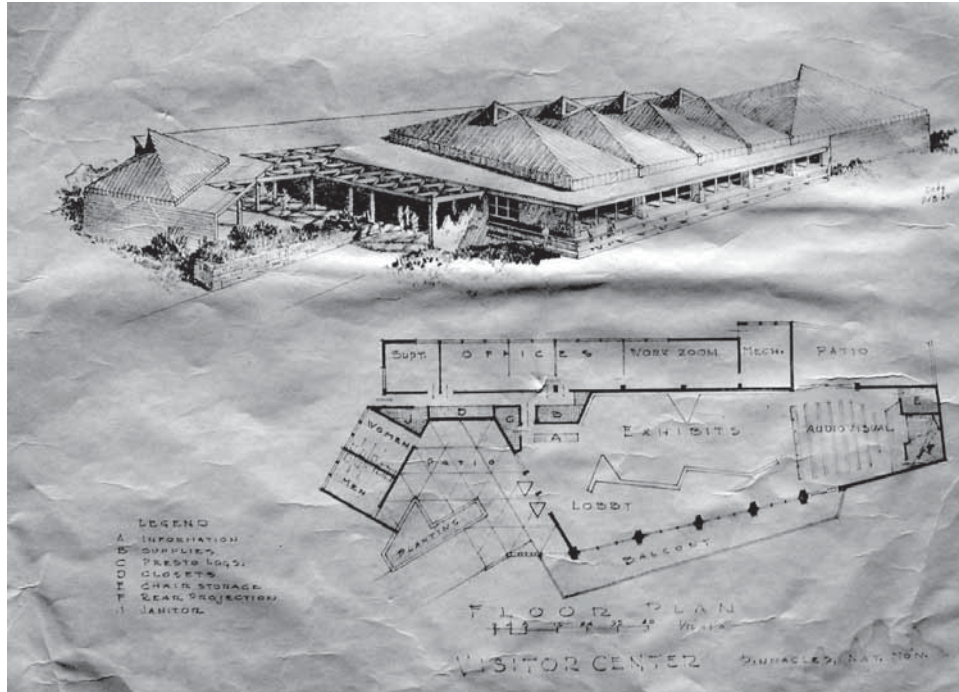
Architect's rendering of proposed visitor center from 1966. This building would have stood on the northeast side of Chalone Creek a short distance above the Chalone Creek Bridge. It was never built. [Map Coll., PNM.]
